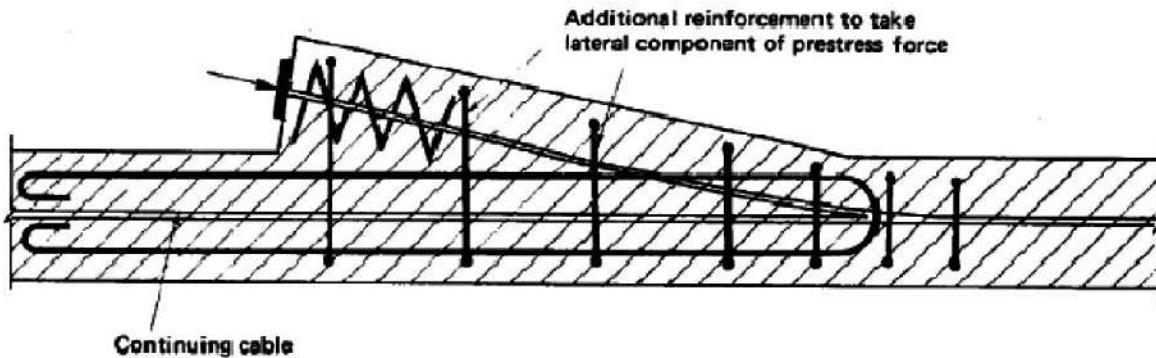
Typical Reinforcement Detail of Blister Block
